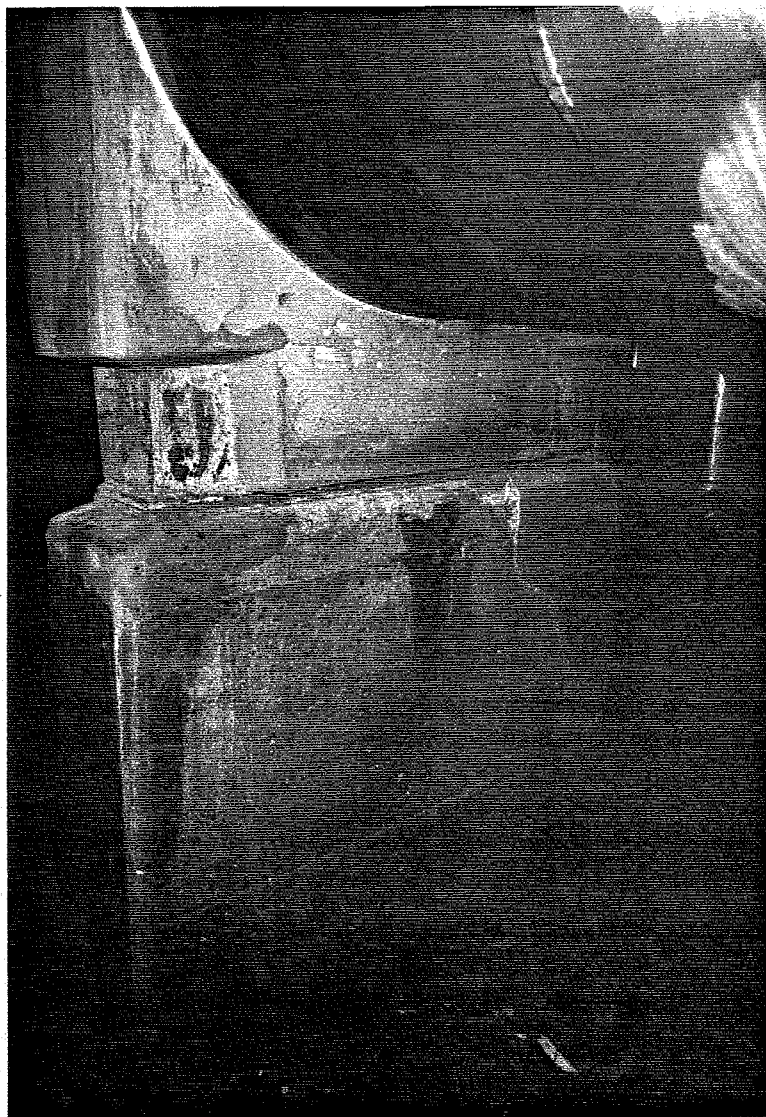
Spalling of cover of reinforced concrete support for heat exchanger.
